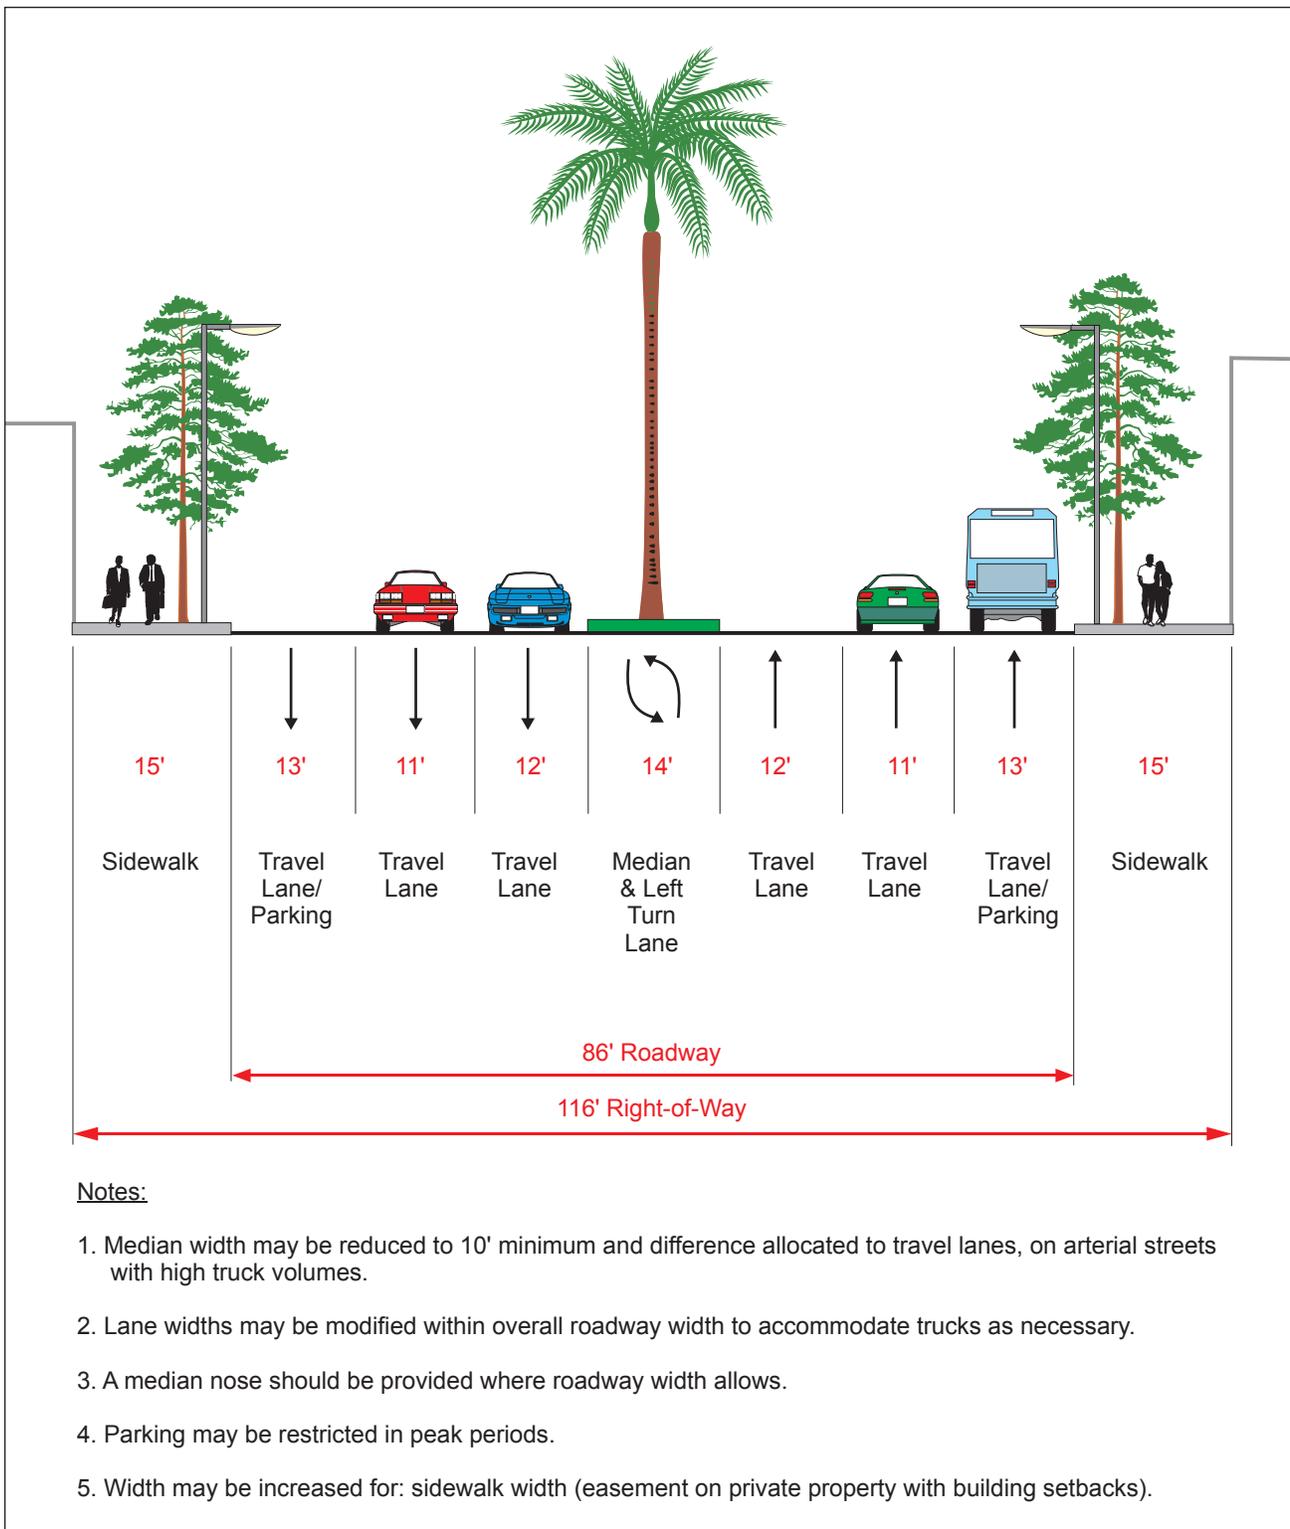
Proposed Street Standard Section for Firestone Boulevard West of Evergreen Avenue & East of Hildreth Avenue - For Enhanced Intersections
